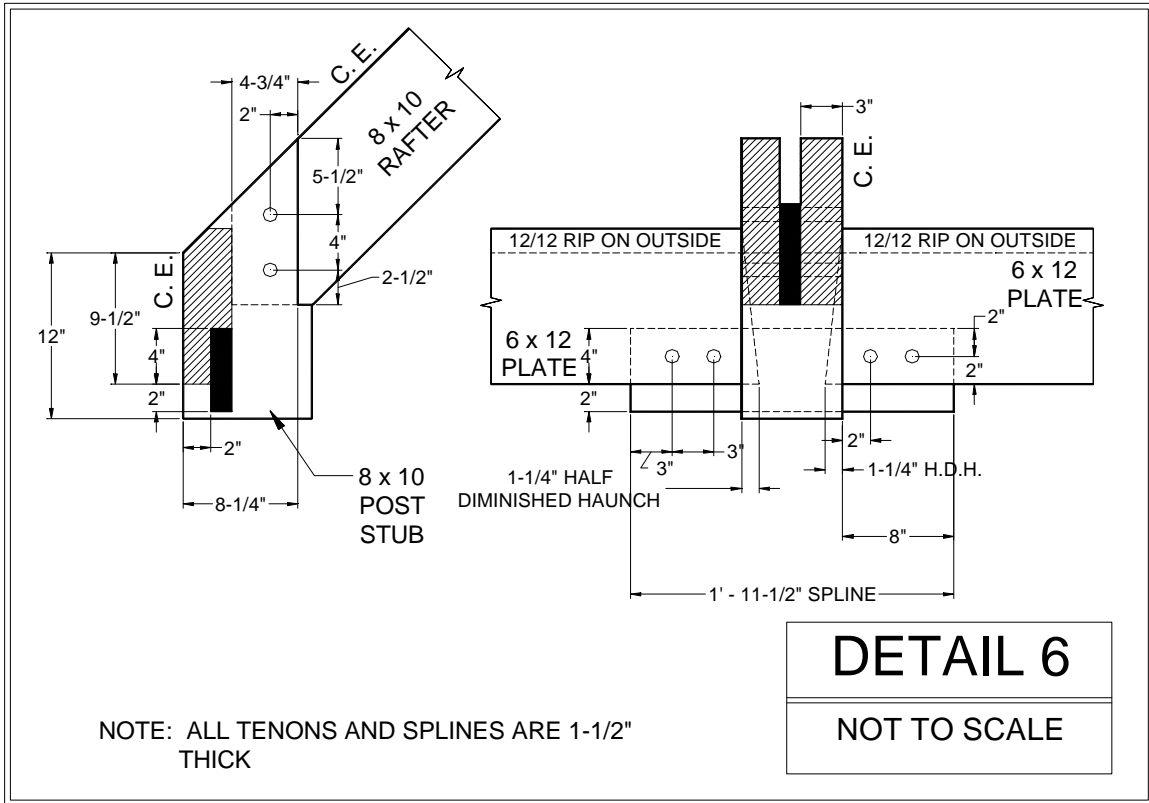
Example of typical center rafter, post stub and plate joint consisting of a tenon cut into the rafter which fits into a mortise in the post stub and a half diminished haunch and slot cut into the plates and post stub into which fit an oak spline. The joint is secured with 1 in. diameter red oak pegs.
